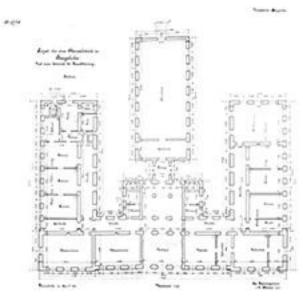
Ober-Realgymnasium in Banja Luka; ground floor plan [9: table 1]
